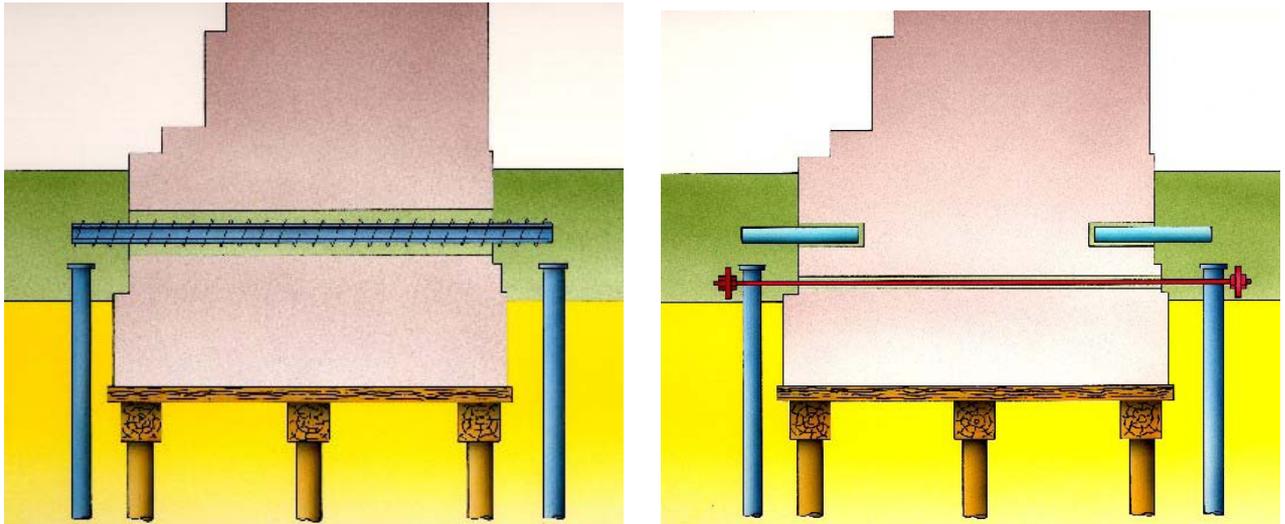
Insertion girders and wall plates in parallel pile arrangement (New Museum, Berlin)
